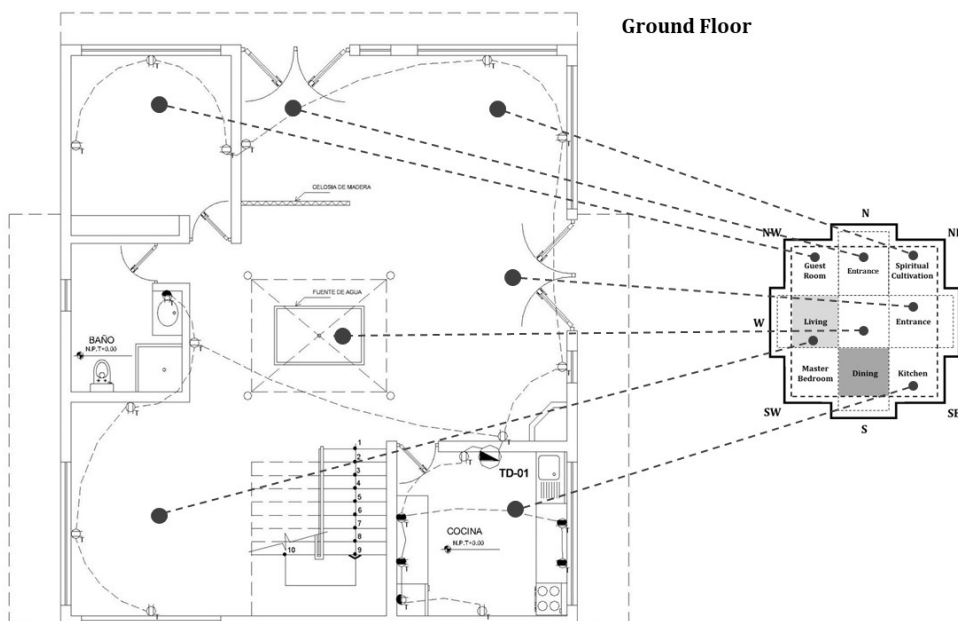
House 2 ground floor plan in relation to indicative floor plan of MVA home
